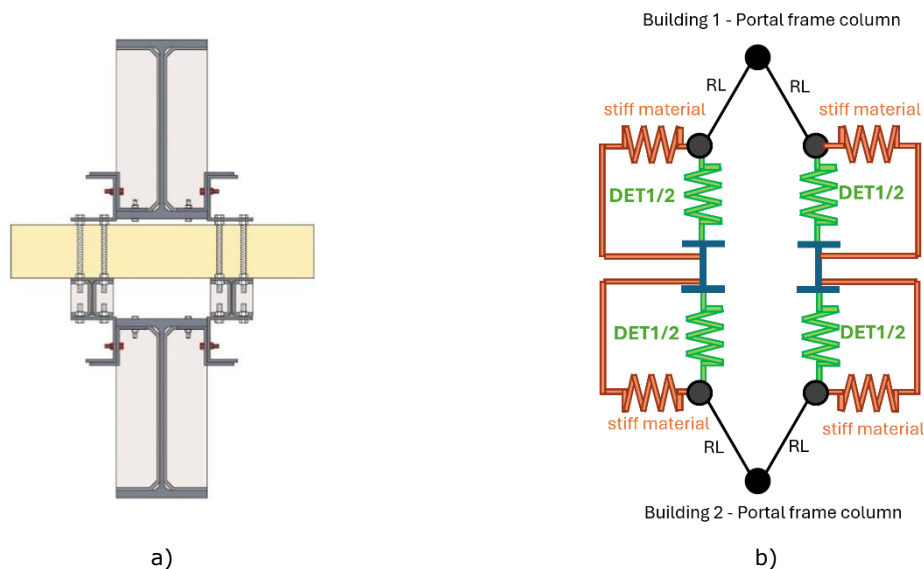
a) Detail 1 building configuration and b) corresponding numerical model
